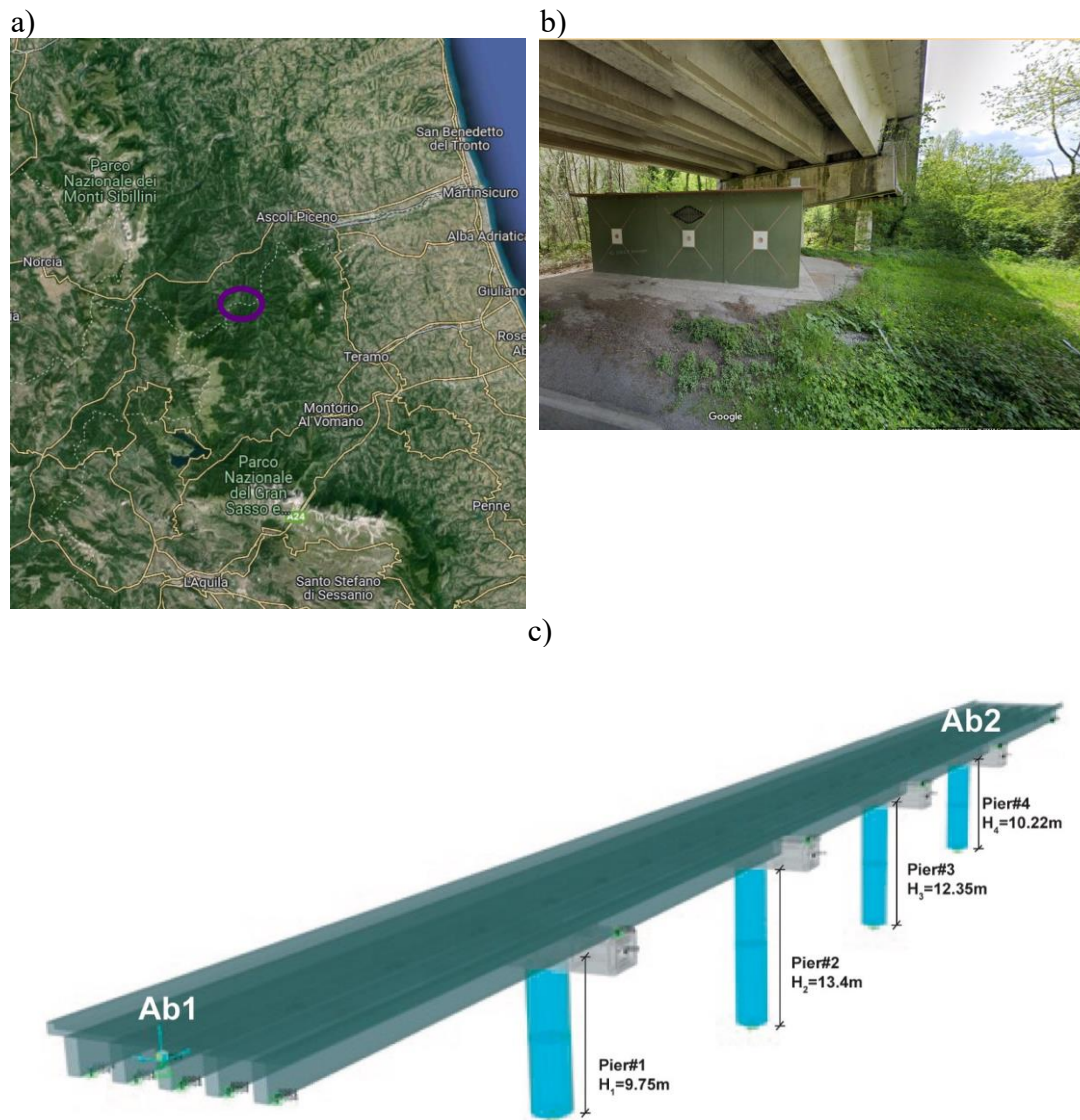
Bridge site location a); Bridge Street-view photograph b); 5-span bridge model - extrude view in SAP2000 [91] c).
